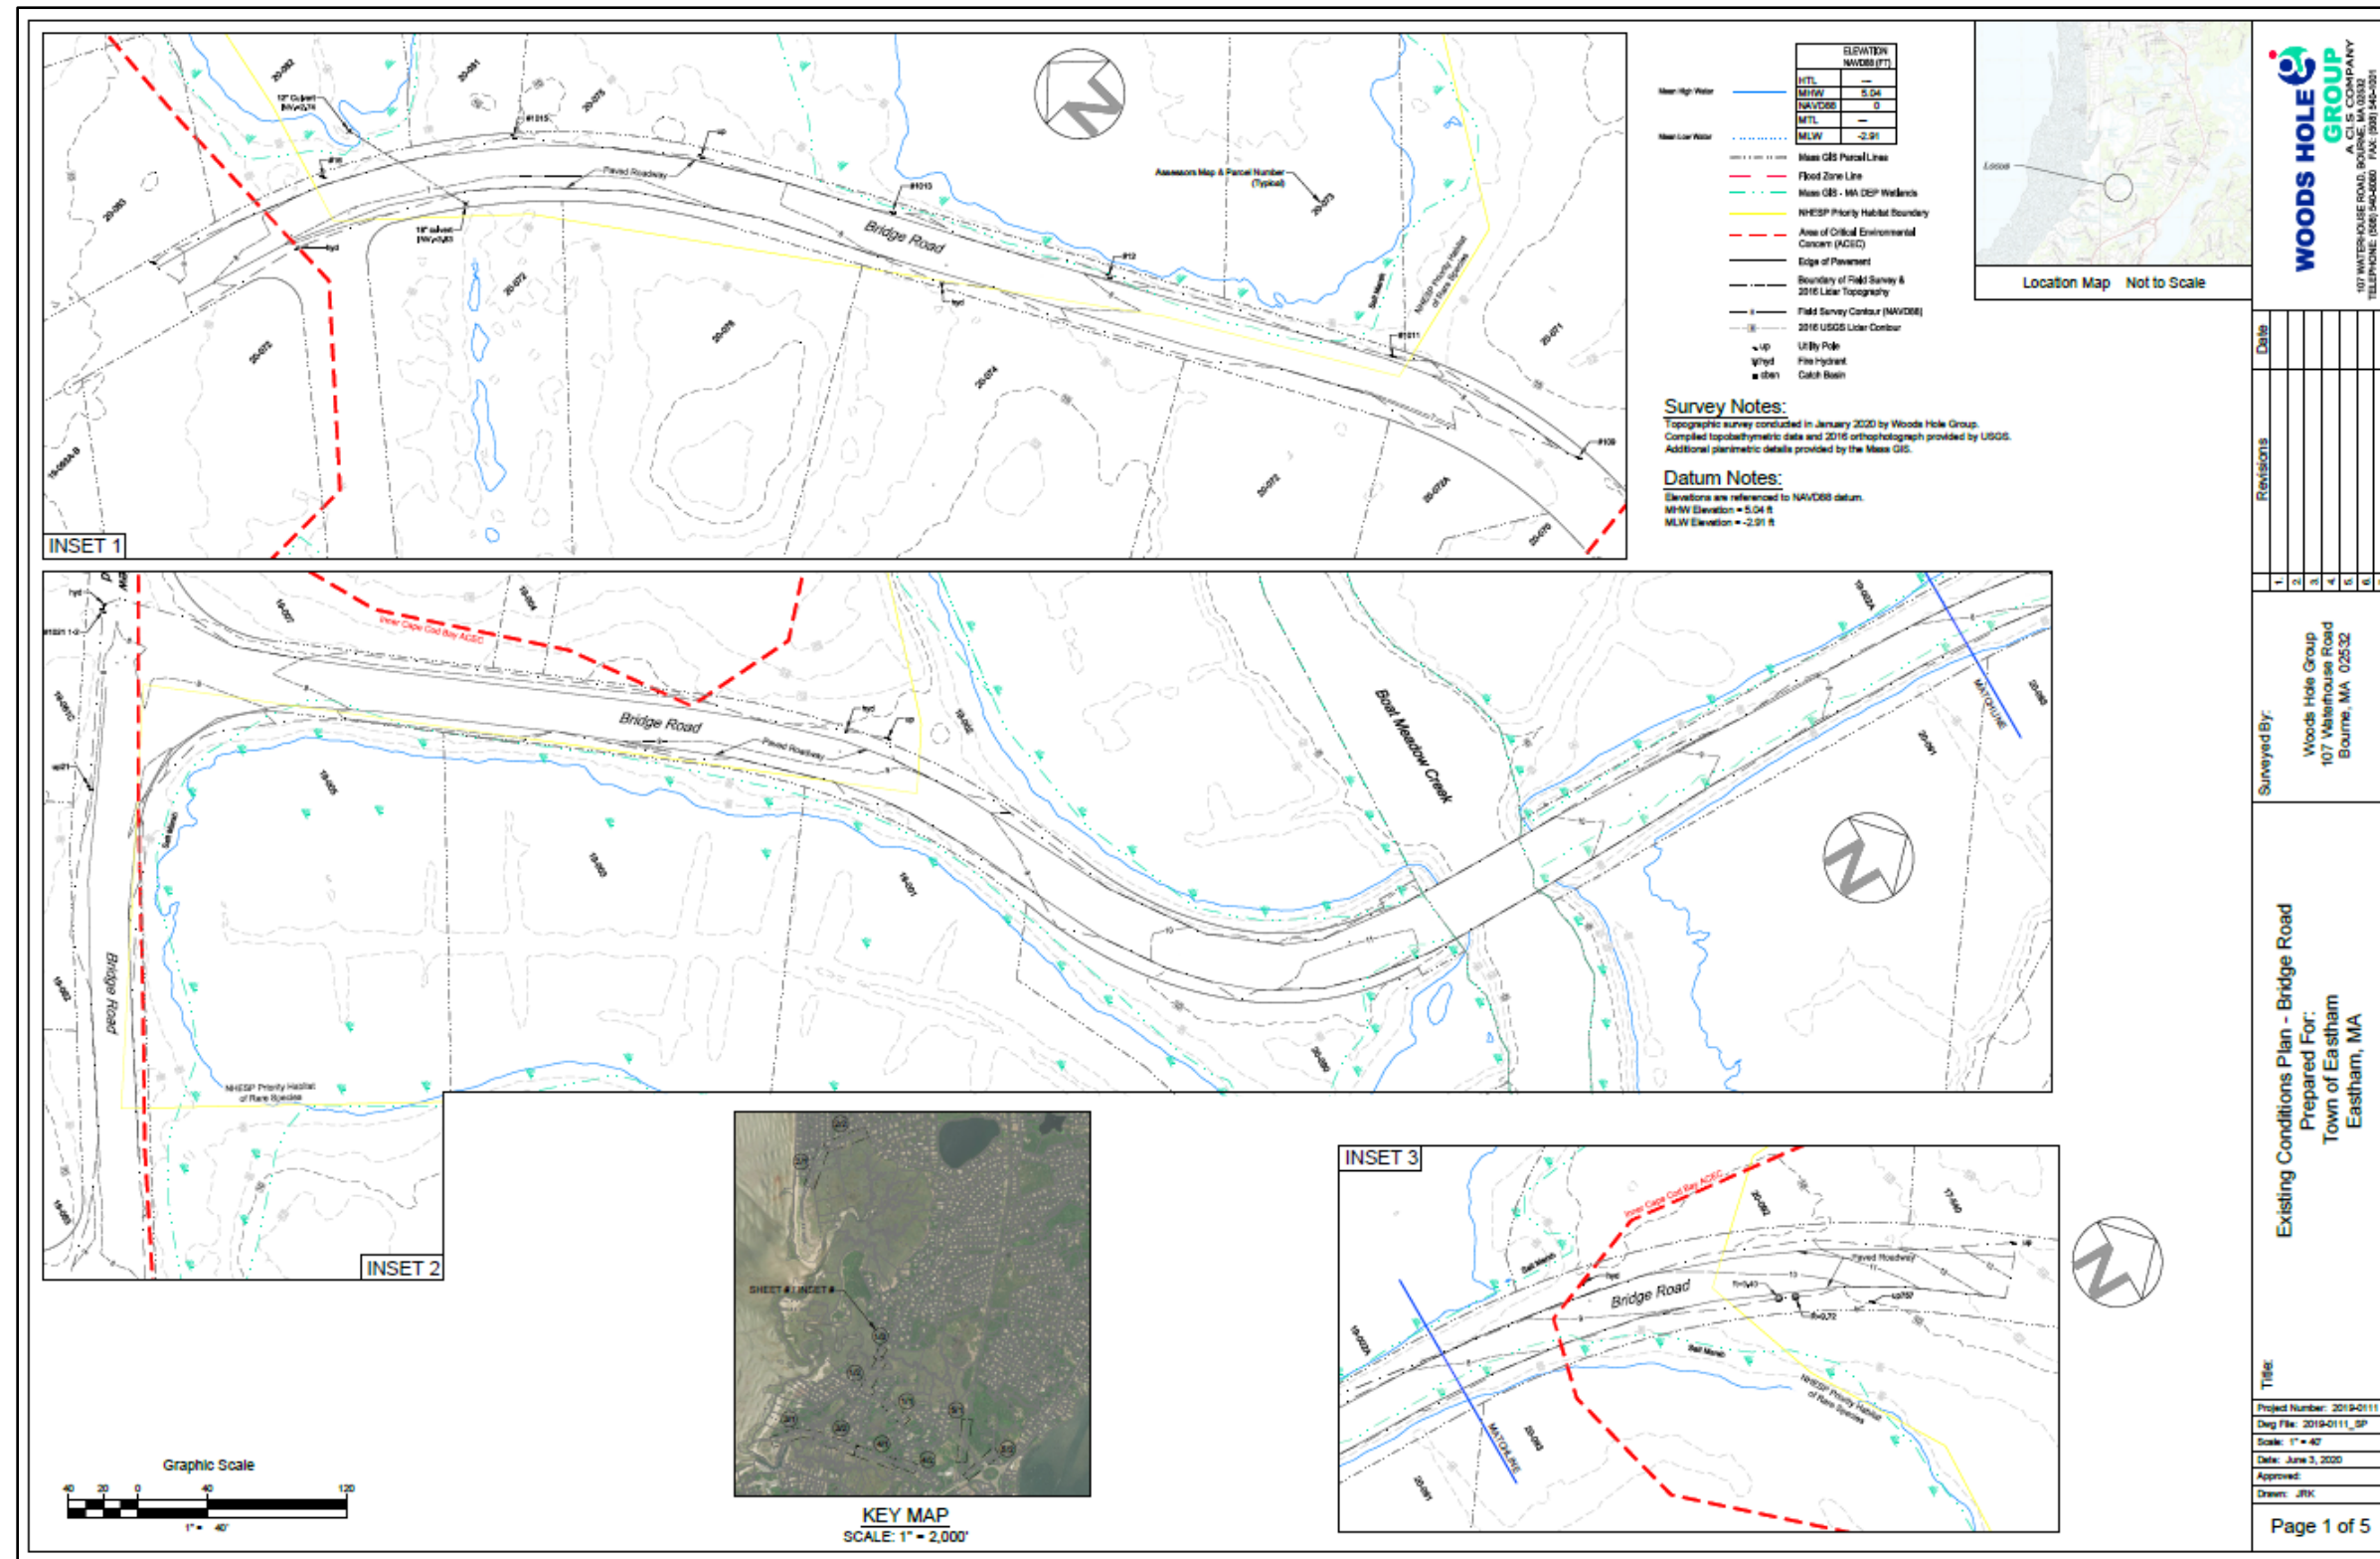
Bridge Road, Eastham, MA existing conditions plan sheet.
